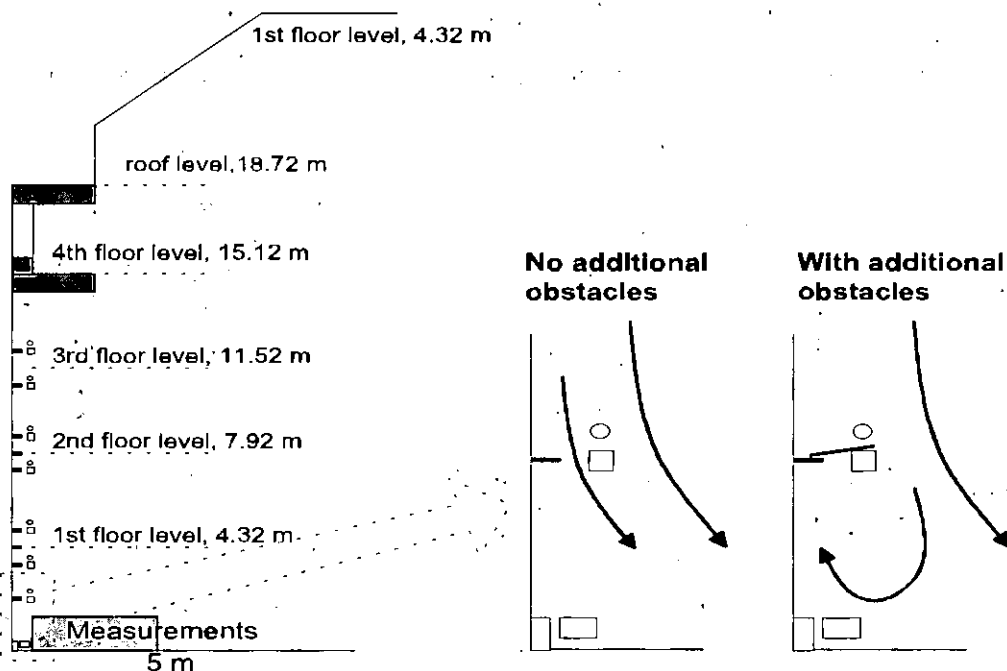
Details of facade with obstacles (part of structure and heater elements). In some experiments the cold air downdraught has been inhibited by adding additional obstacles.
